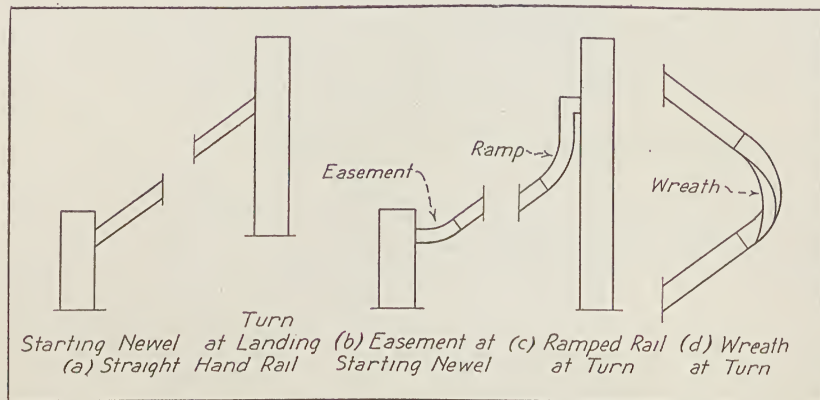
Stair Rails, Easements, Ramps and Wreaths
